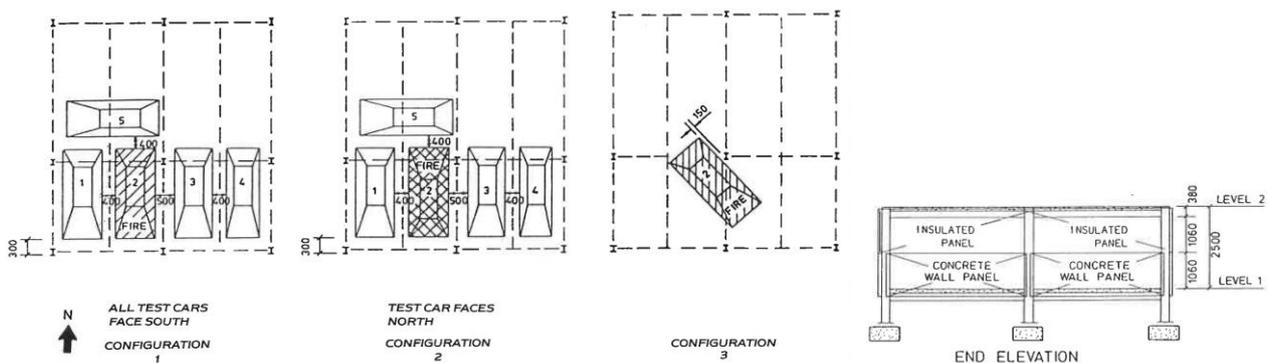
Plan and elevation drawings showing test building. Reproduced from [43].
